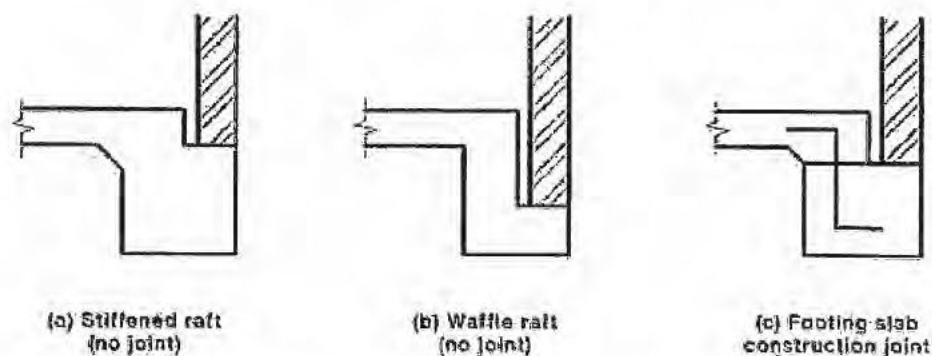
EXAMPLES OF FOOTING SYSTEMS REQUIRING NO JOINT TREATMENT
